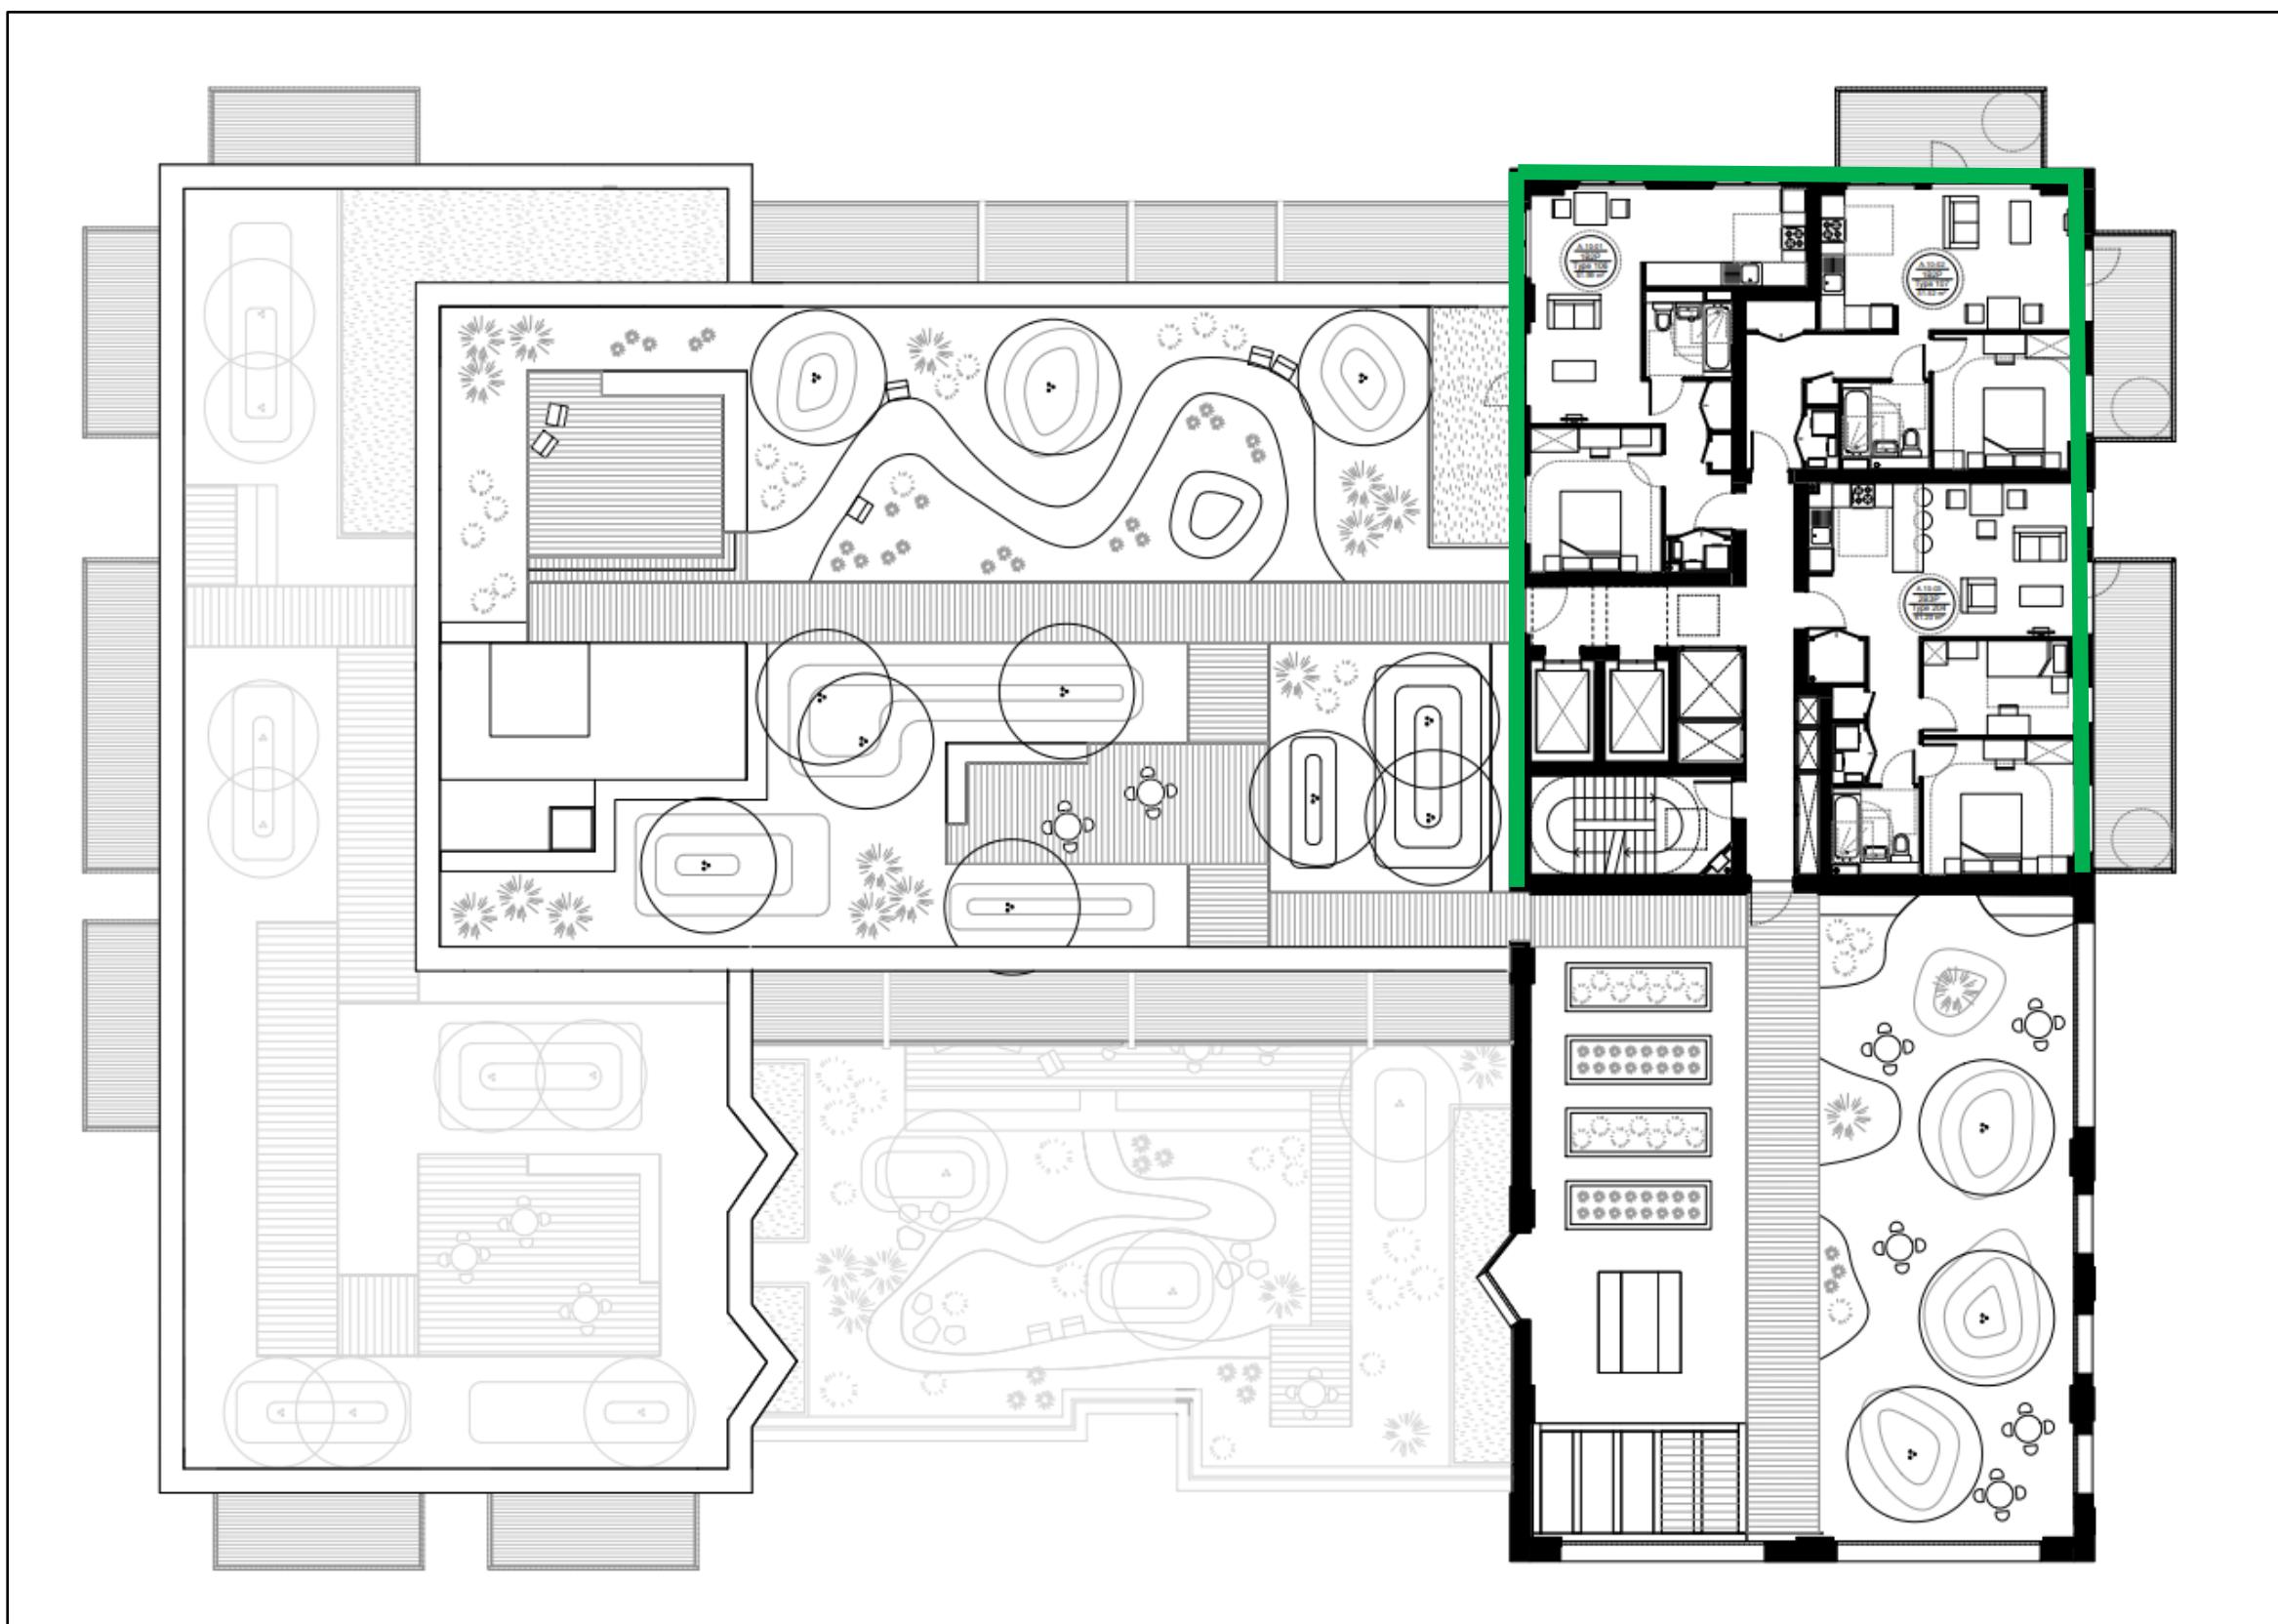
Acoustic glazing "Façade Zones" –Level 10
